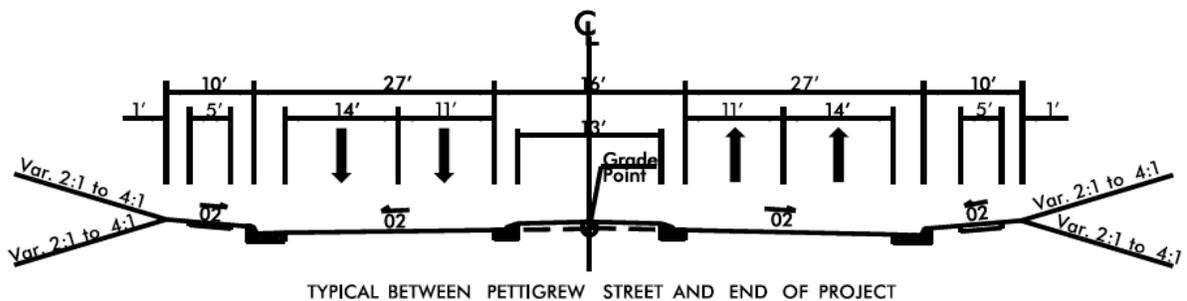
Four-lane Typical Section, 90 feet wide not including slopes
